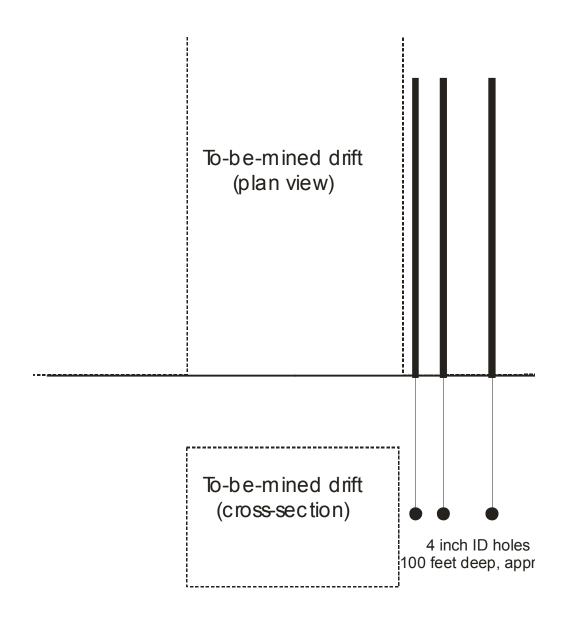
Sketch of hole layout for mine-by test when constructed in the rib of a future drift. Drawing is not to scale. Nominal rib-hole spacings would be 2, 4 and 10 feet.
